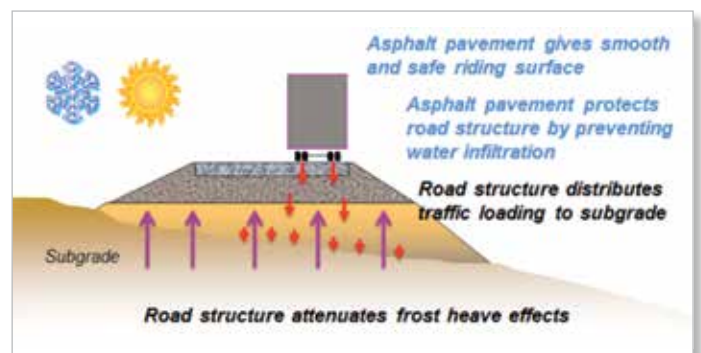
The two roles of road pavement structure in cold regions and function of asphalt pavement layers.
